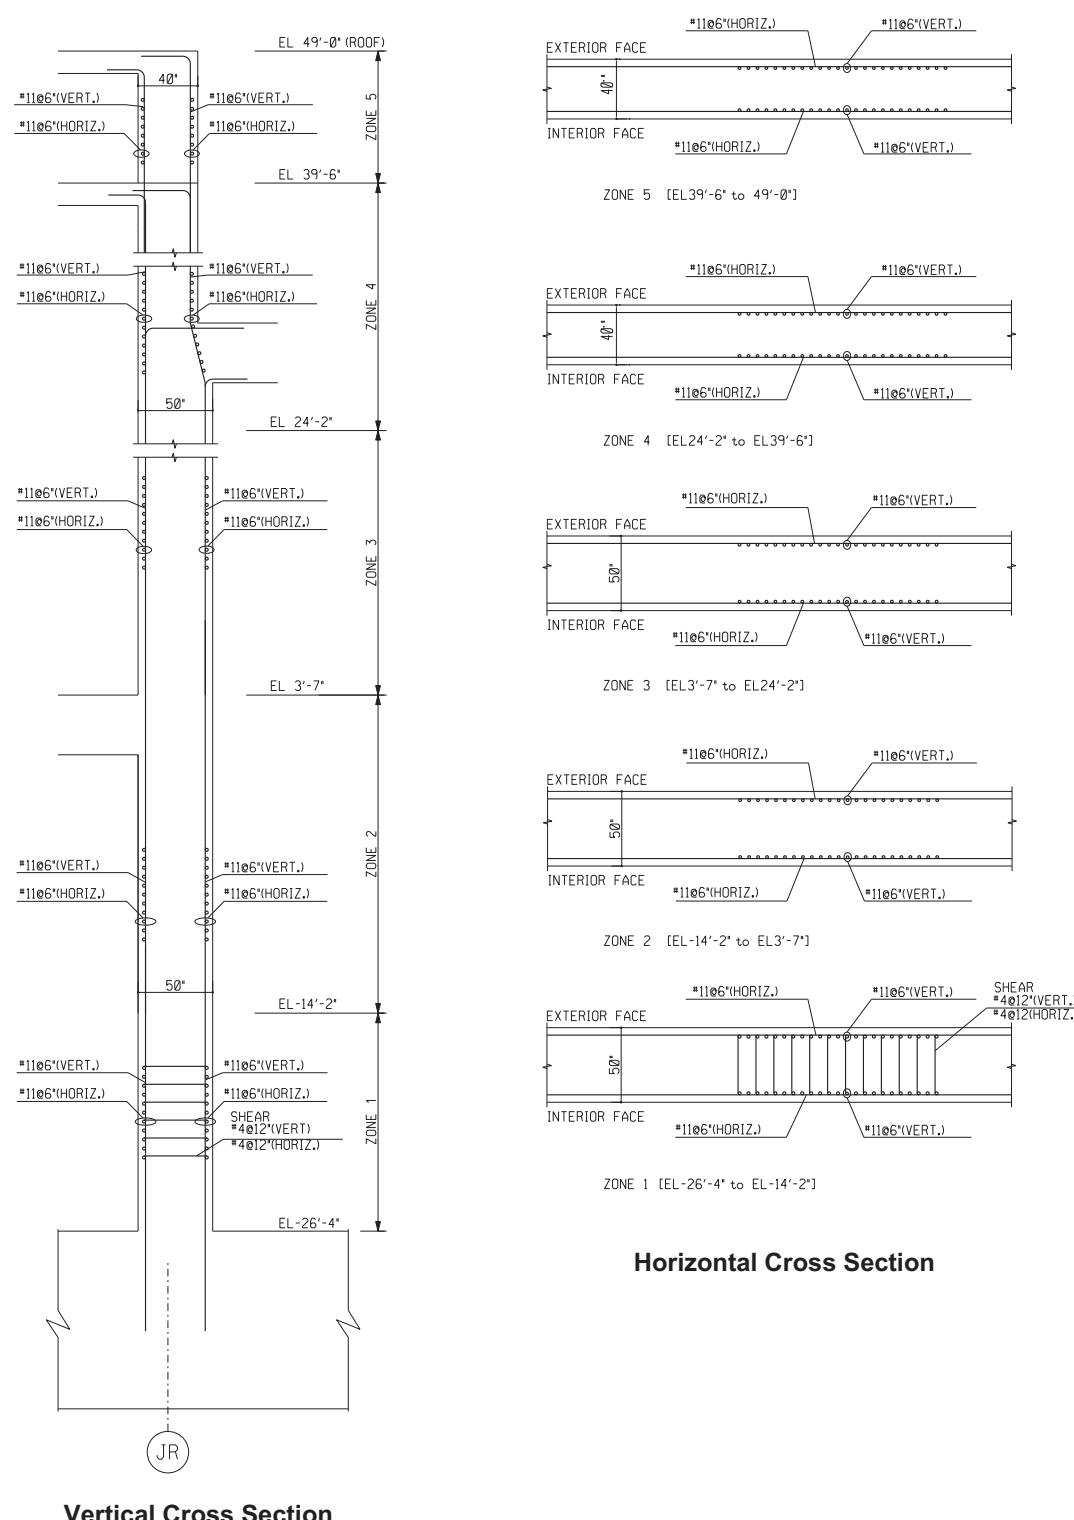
Typical Reinforcement in South Exterior Wall – SECTION 1
